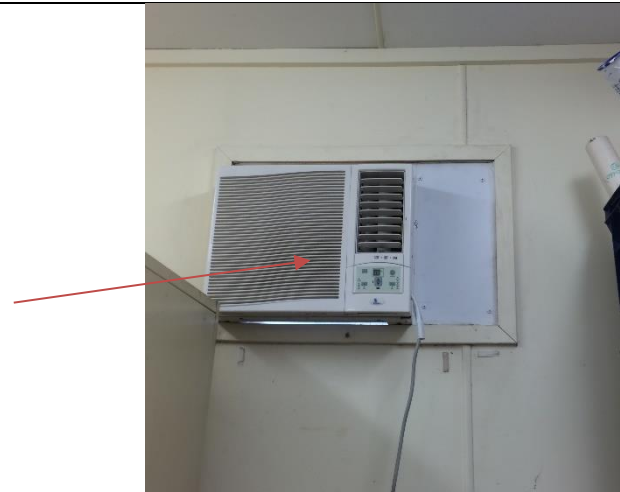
Exhibits – Internal – Refrigerant gas within Kelvinator air conditioning unit – ODS (A4)
